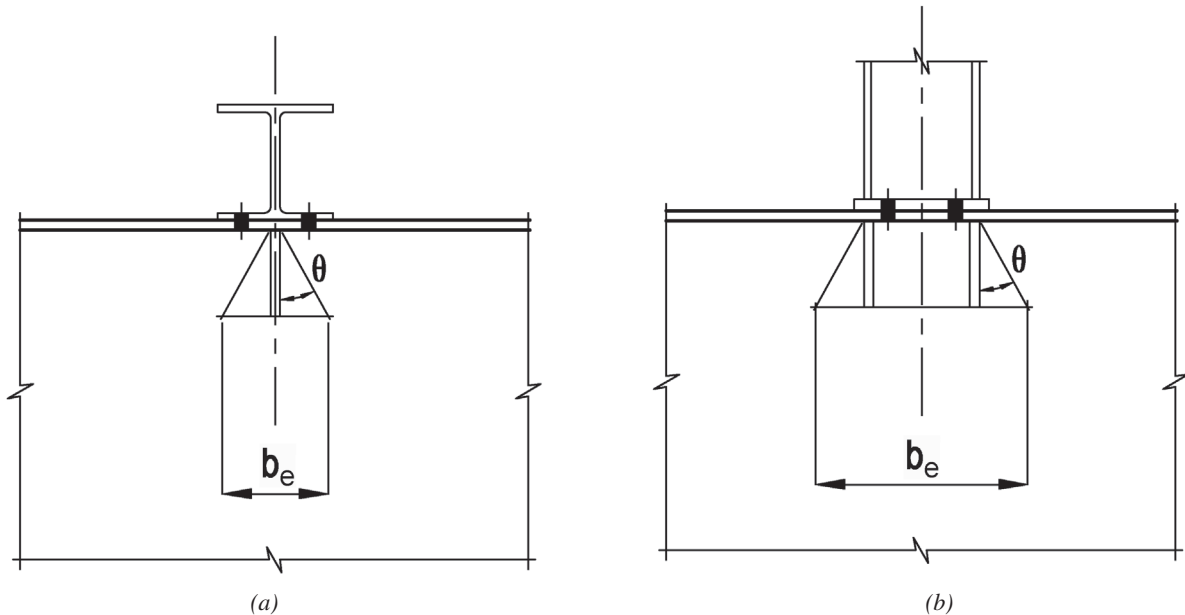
Detail for concentrated load at the roof of a tank or silo: (a) single stiffener; (b) multiple stiffeners.
